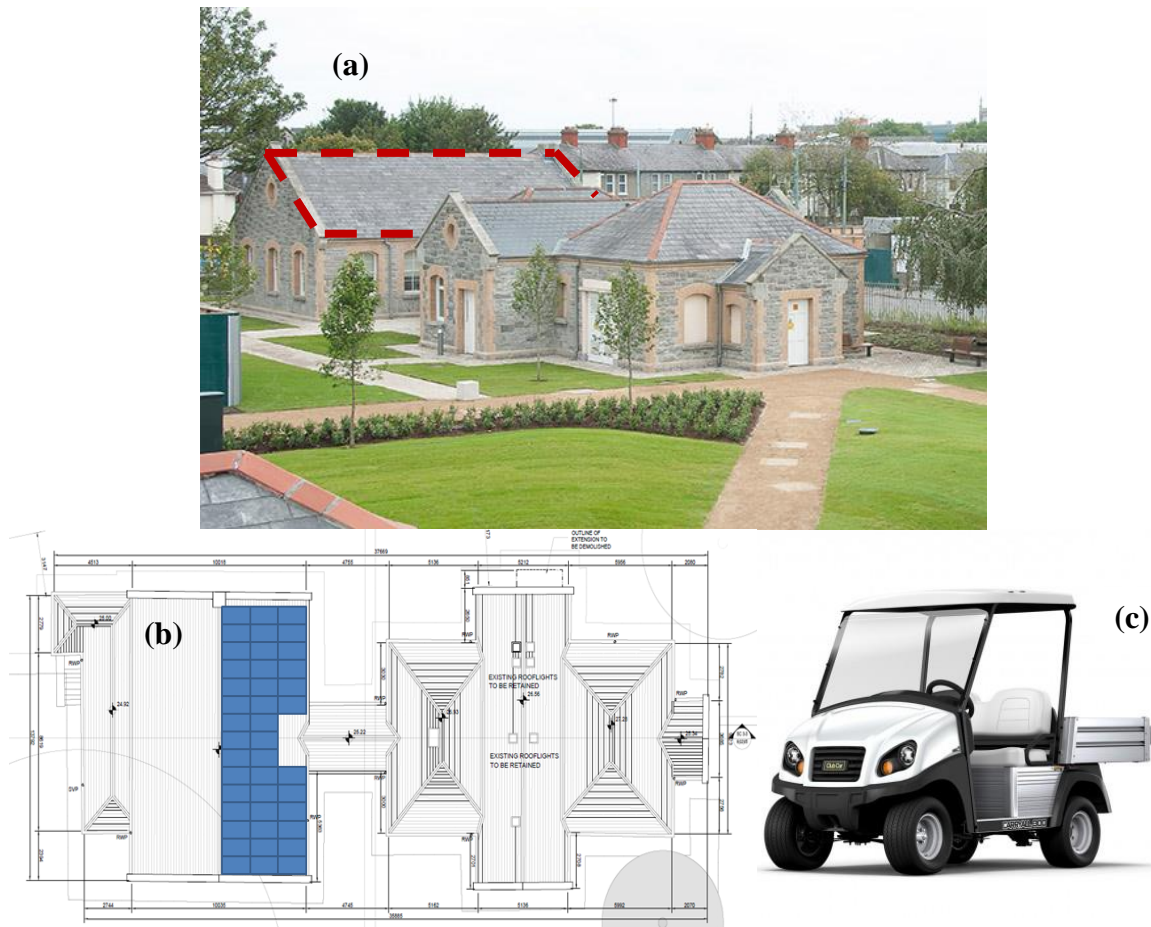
Orchard-House Building site (a), Roof schematic plans (b), CarryAll 500 LEV (c)
